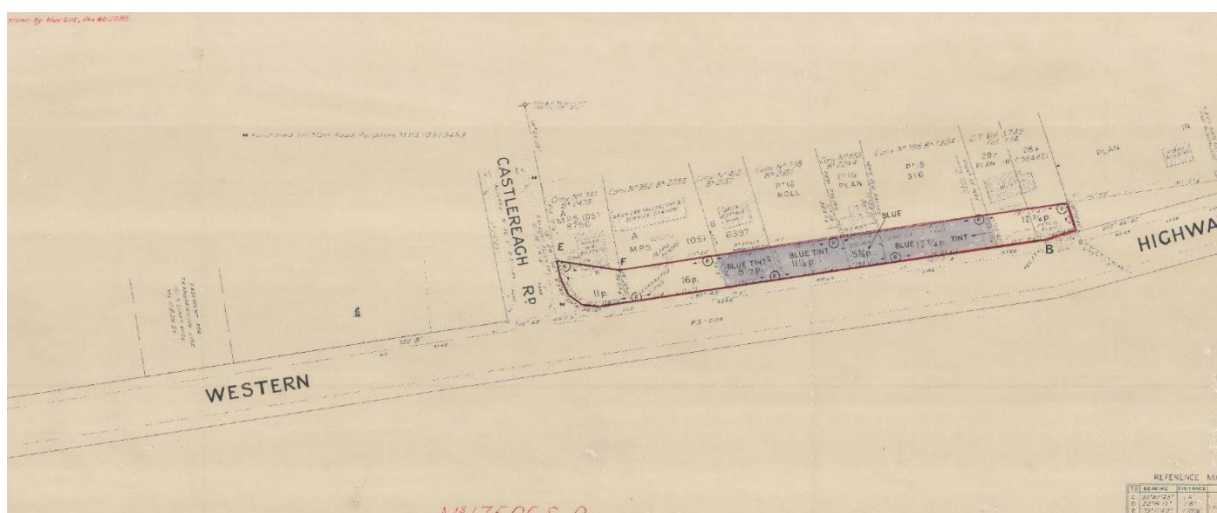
Detail of a 1959 plan showing the proposed realignment of Castlereagh Road (LPI Crown Plan 17563.3000).
